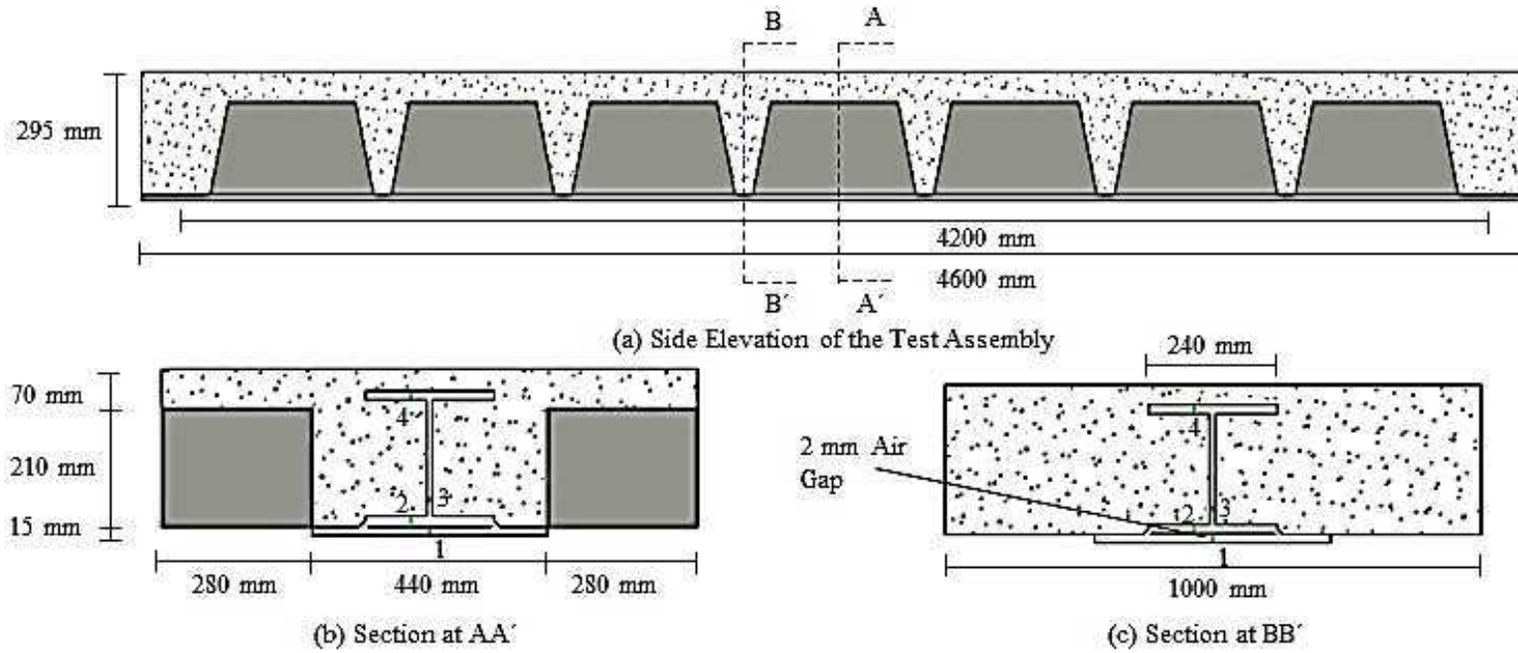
Side elevation and location of selected sections along the span of fabricated slim floor beam with composite floor slab
